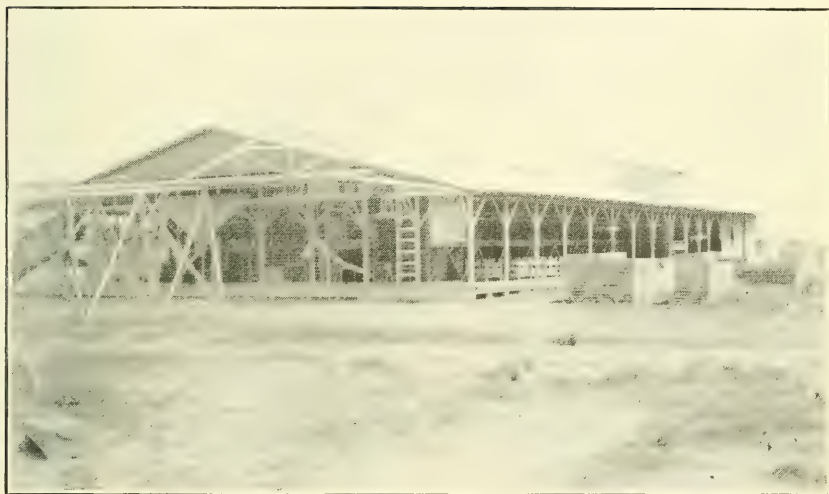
A MODEL KILN DRYING PLANT FOR CURING BROOM CORN.
